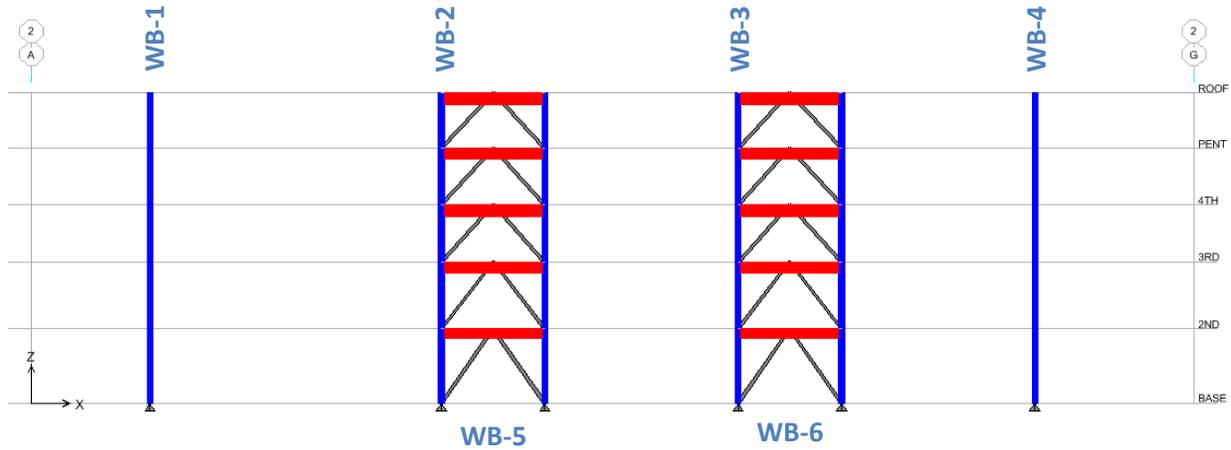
Elevation of braced frames in the X-Direction modeled in ETABS
